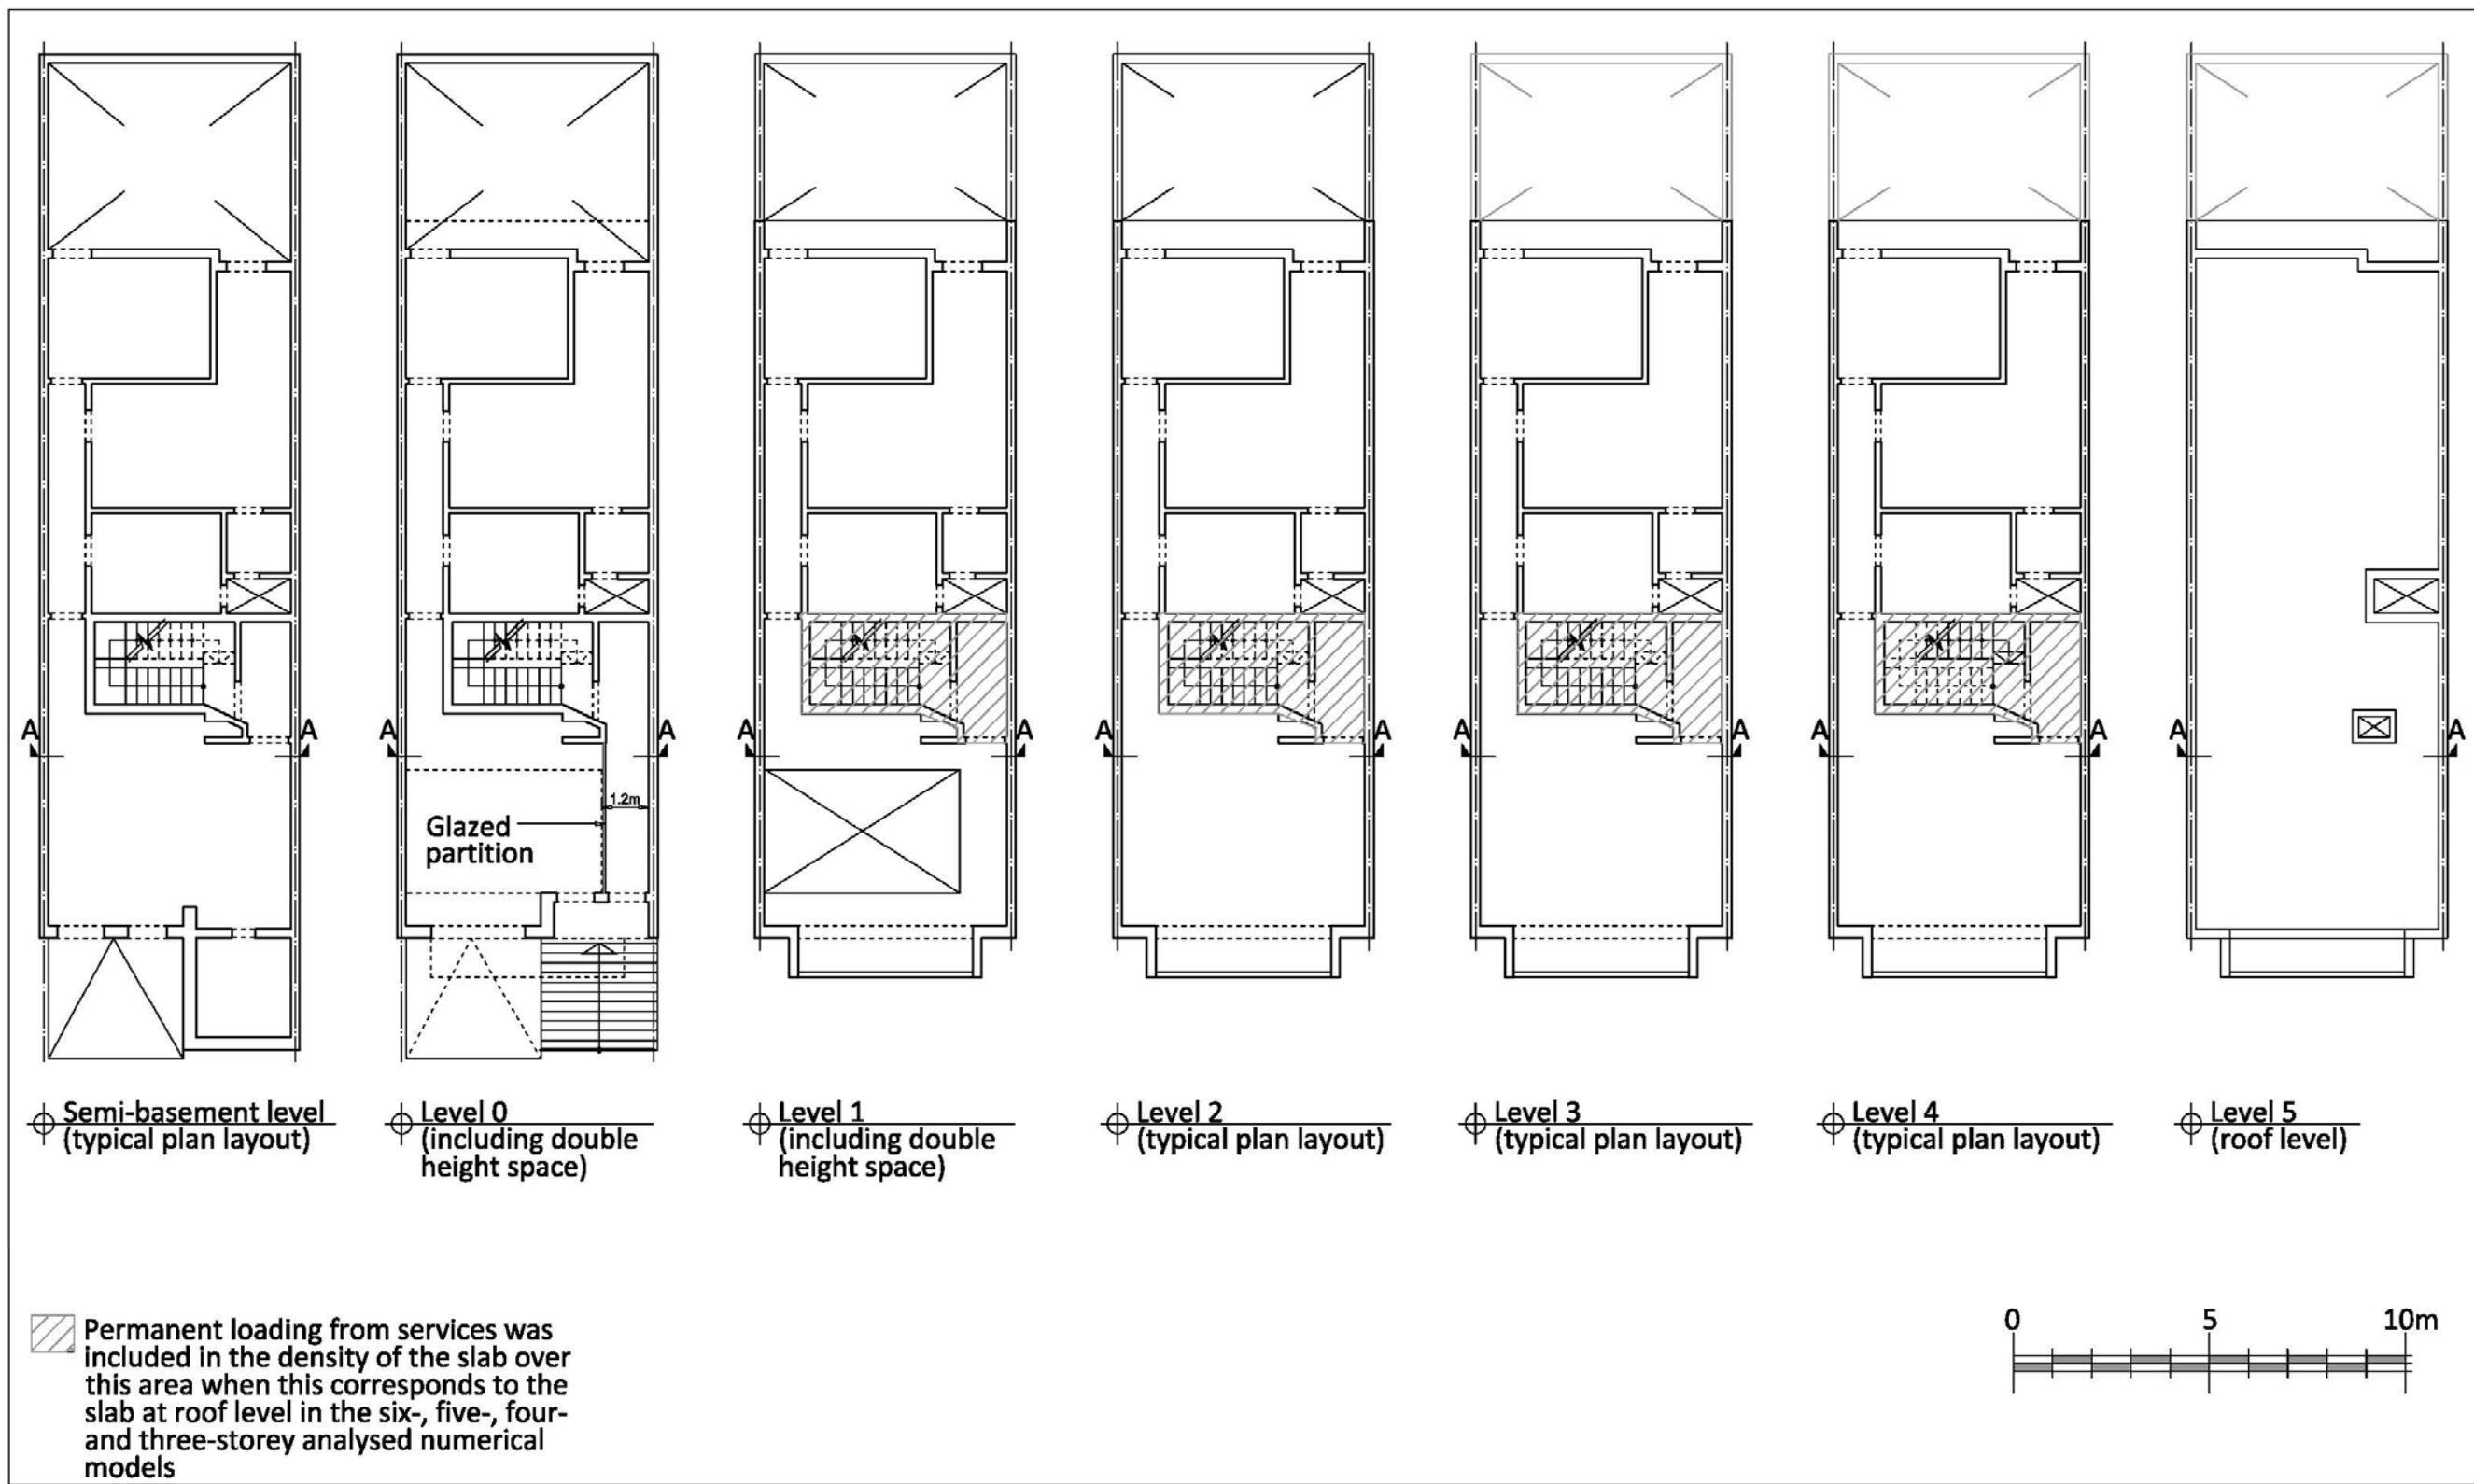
Plan layouts at all levels for analysed single building numerical models including a double height space between Levels 0 and 1 (plan length-to-width ratio 2.75:1).
